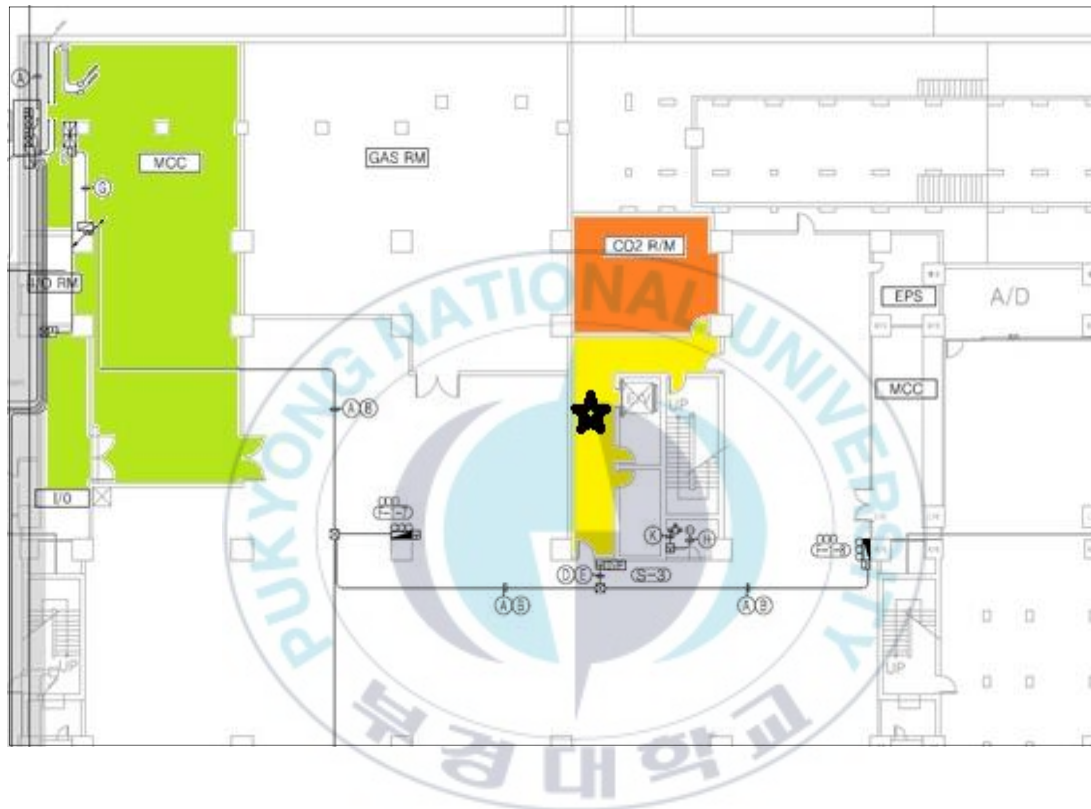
CO₂ storage room and MCC electrical room layout plan.
